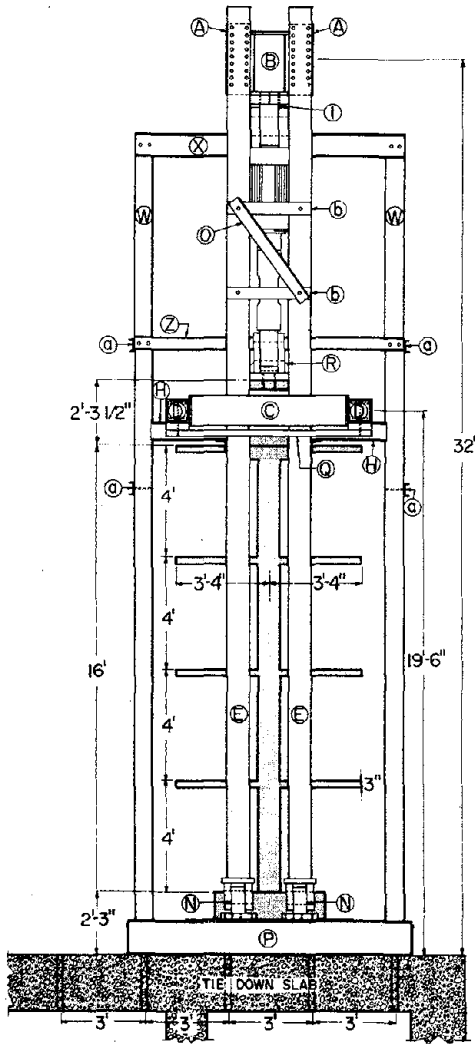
SIDE VIEW OF THE SPECIMEN AND THE TEST FRAME
